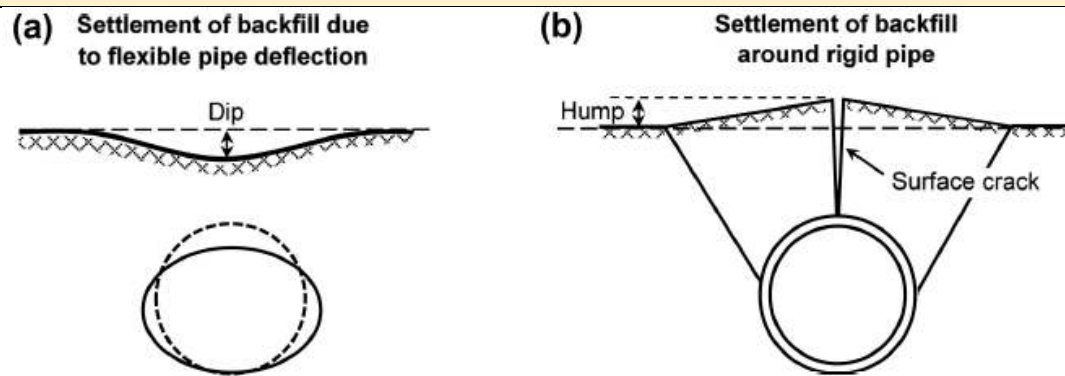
Backfill deformation: (a) flexible pipe; (b) rigid pipe (Watkins and Anderson, 2000)
